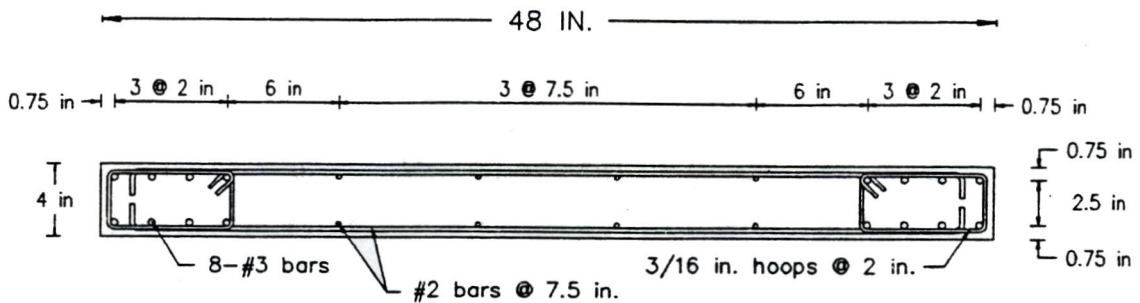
Section of Rectangular Wall RW2 Tested by Thomsen and Wallace (1995)
